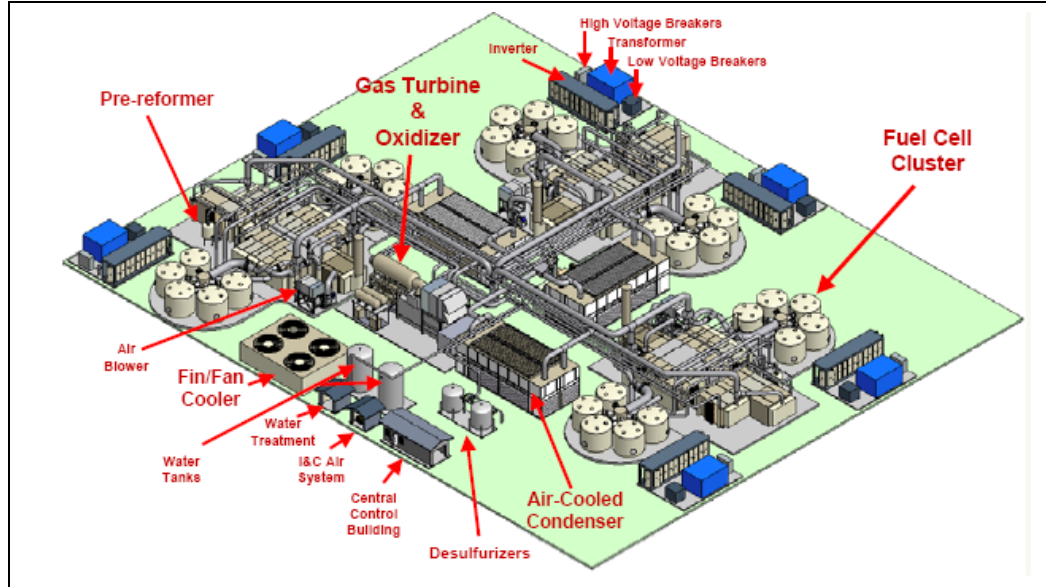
56-MW DFC/T Power Plant Layout and Site Plan for Near-Term High Efficiency Power Generation
